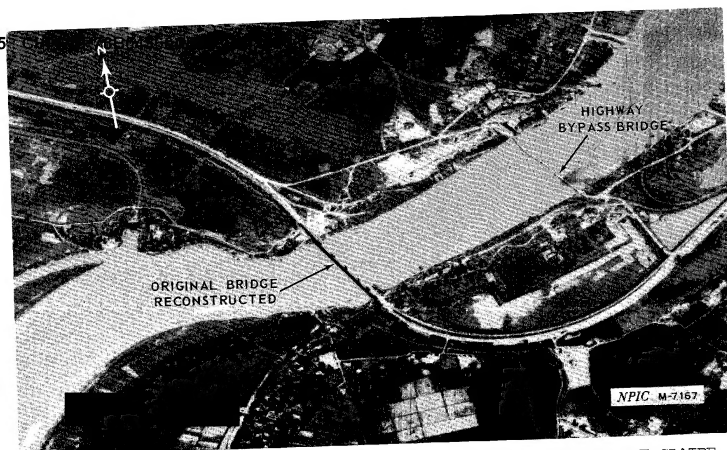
VIET TRI RAILROAD AND HIGHWAY BRIDGE OVER THE RIVIERE CLAIRE
